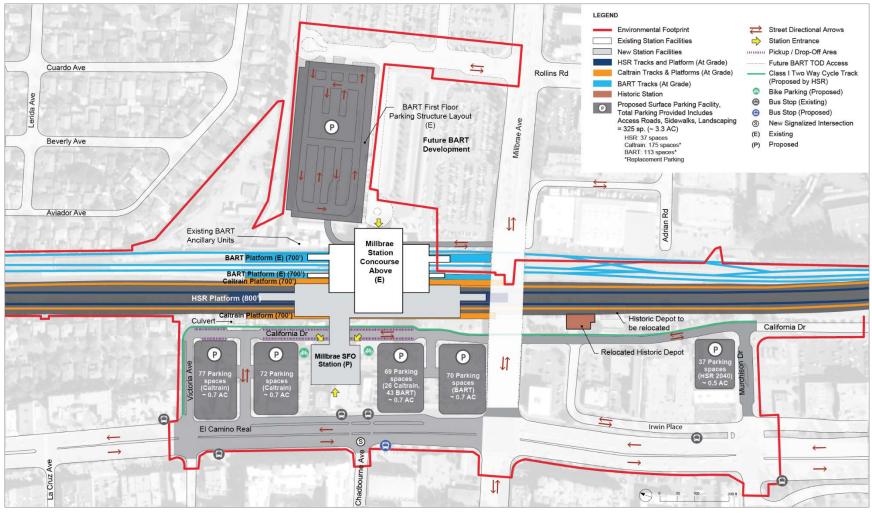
San Bruno to San Mateo Subsection—Alternatives A and B
